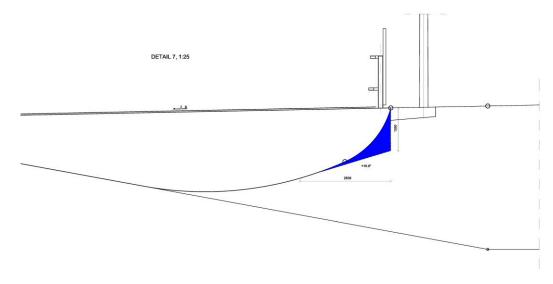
Sharp edge configuration – sharp road deck girder edge.
